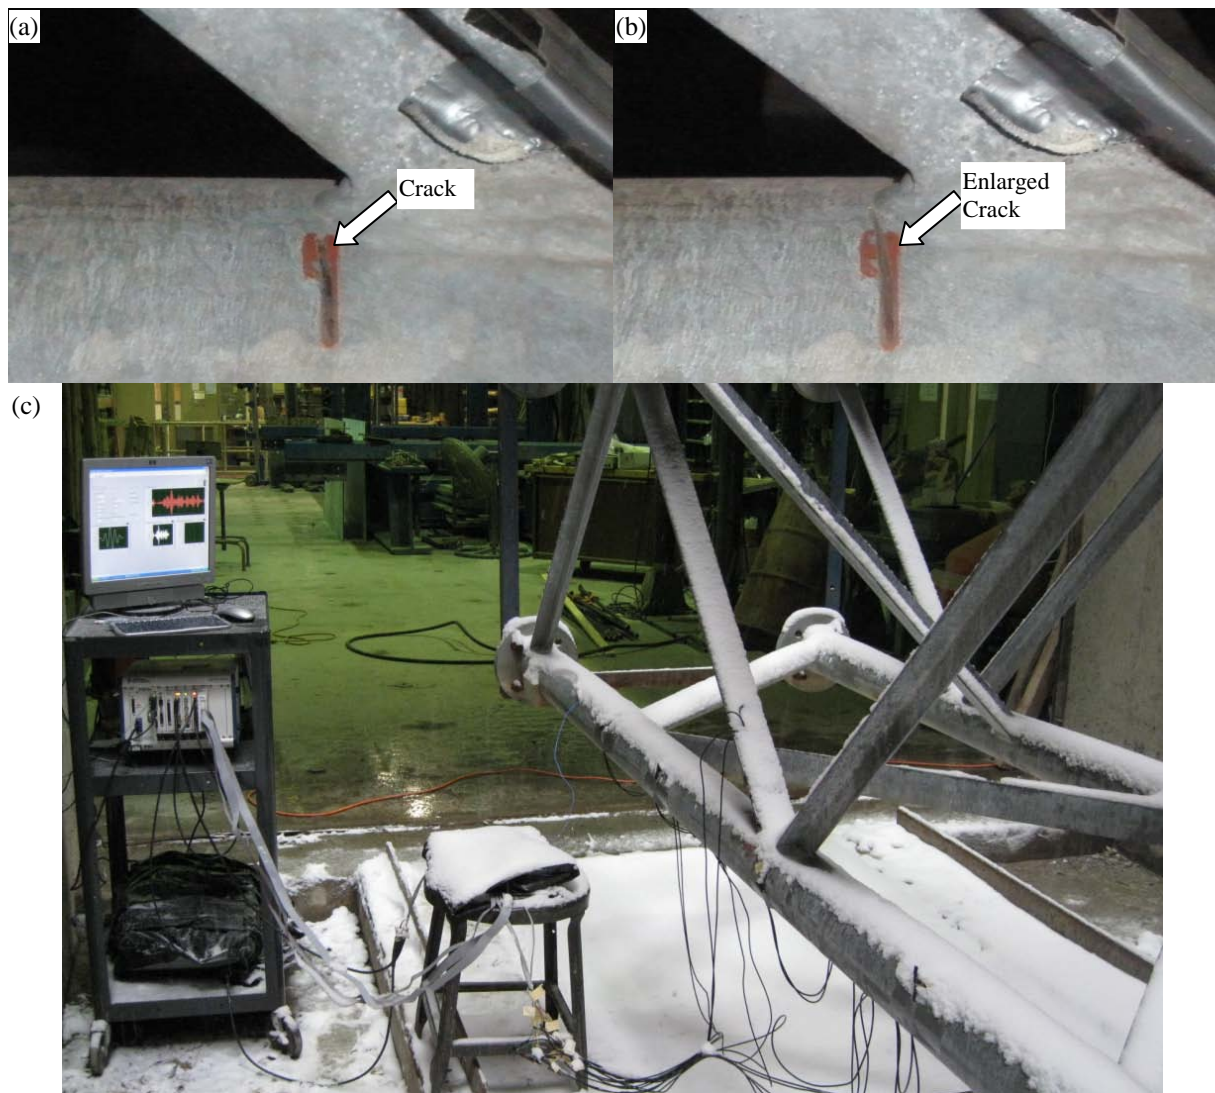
(a) Close-up view of the artificial notch machined along the weld between the chord and one angular diagonal member. (b) Close-up view of enlarged crack. (c) Snowing condition
